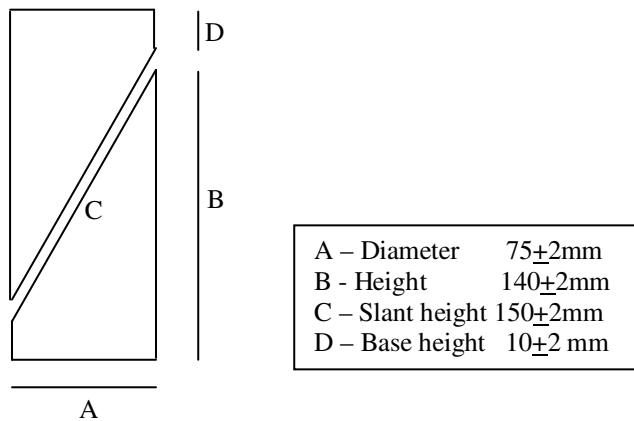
Dimensions of cylindrical specimens used for the standard slant shear test of ASTM C 882/ C 882M
